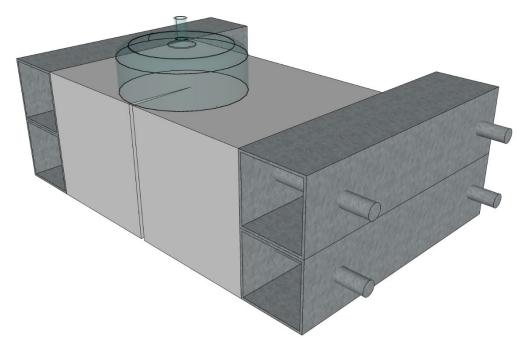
Illustration of the notched beam with a crack and a glass cup fixed on the side of the beam, prior to sealing the crack.
